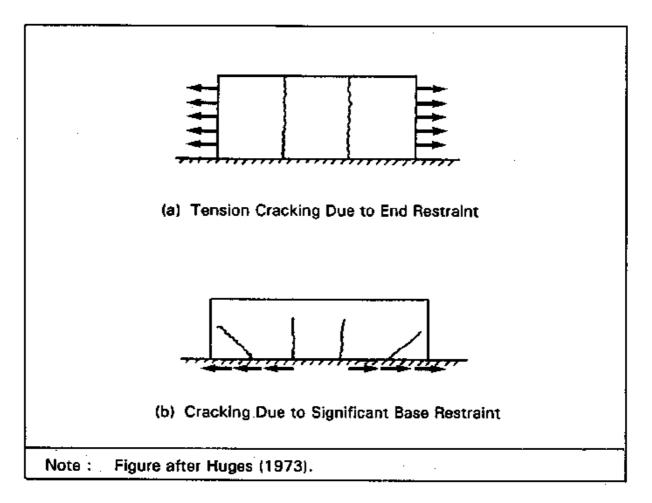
Possible Crack Pattern on Walls due to Restraints Against Contraction
